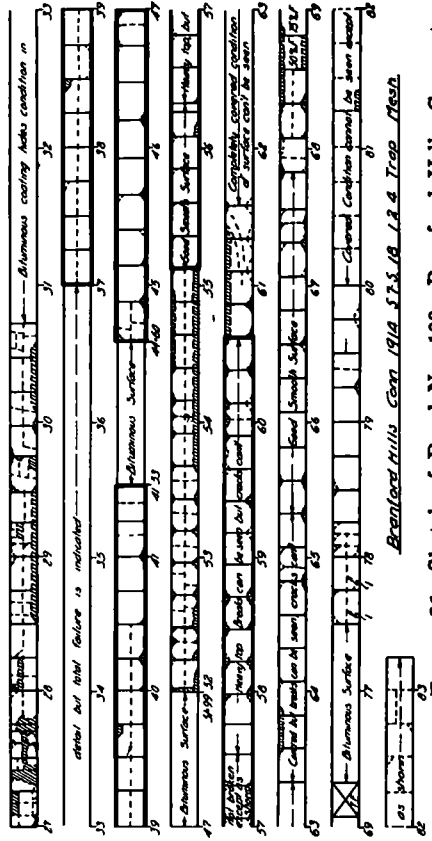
Sketch of Road No. 100—Branford Hills, Connecticut
